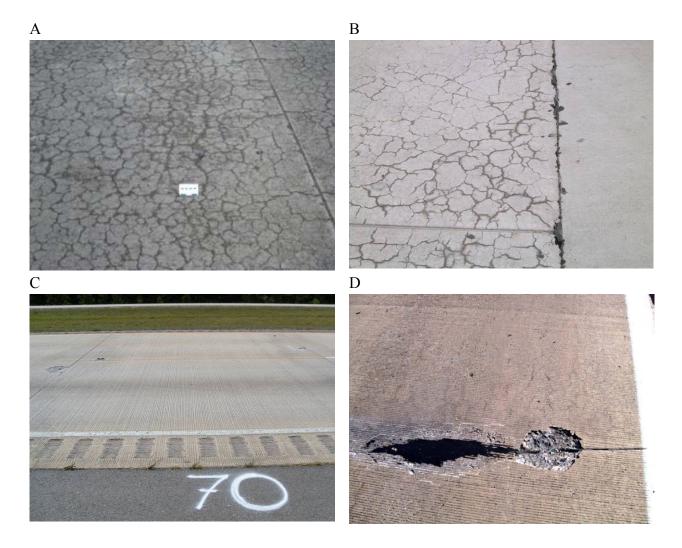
ASR-related defects in pavements and severity assessment. A. Map cracking of concrete pavement (condition state 3). B. Joint Sealant Failure in Concrete Pavement (condition state 3). C. Joint Deterioration in Concrete Pavement (condition state 2). D. Joint Deterioration in Concrete Pavement (condition state 3).
